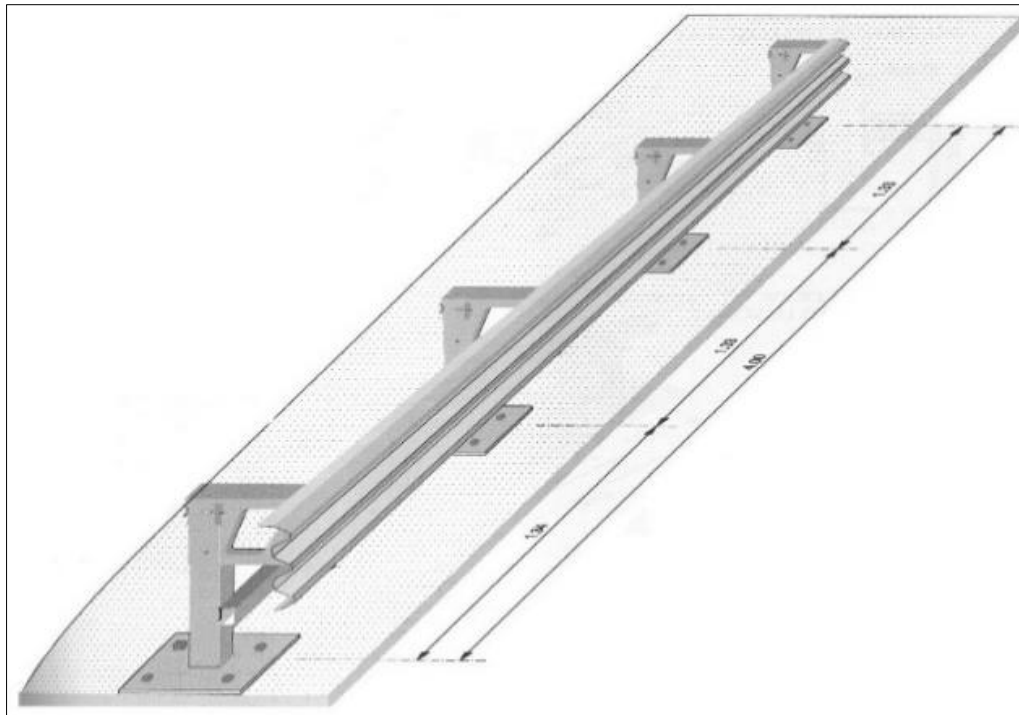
Example of reinforced guardrail that can be used on bridges (GDH, 2005)
